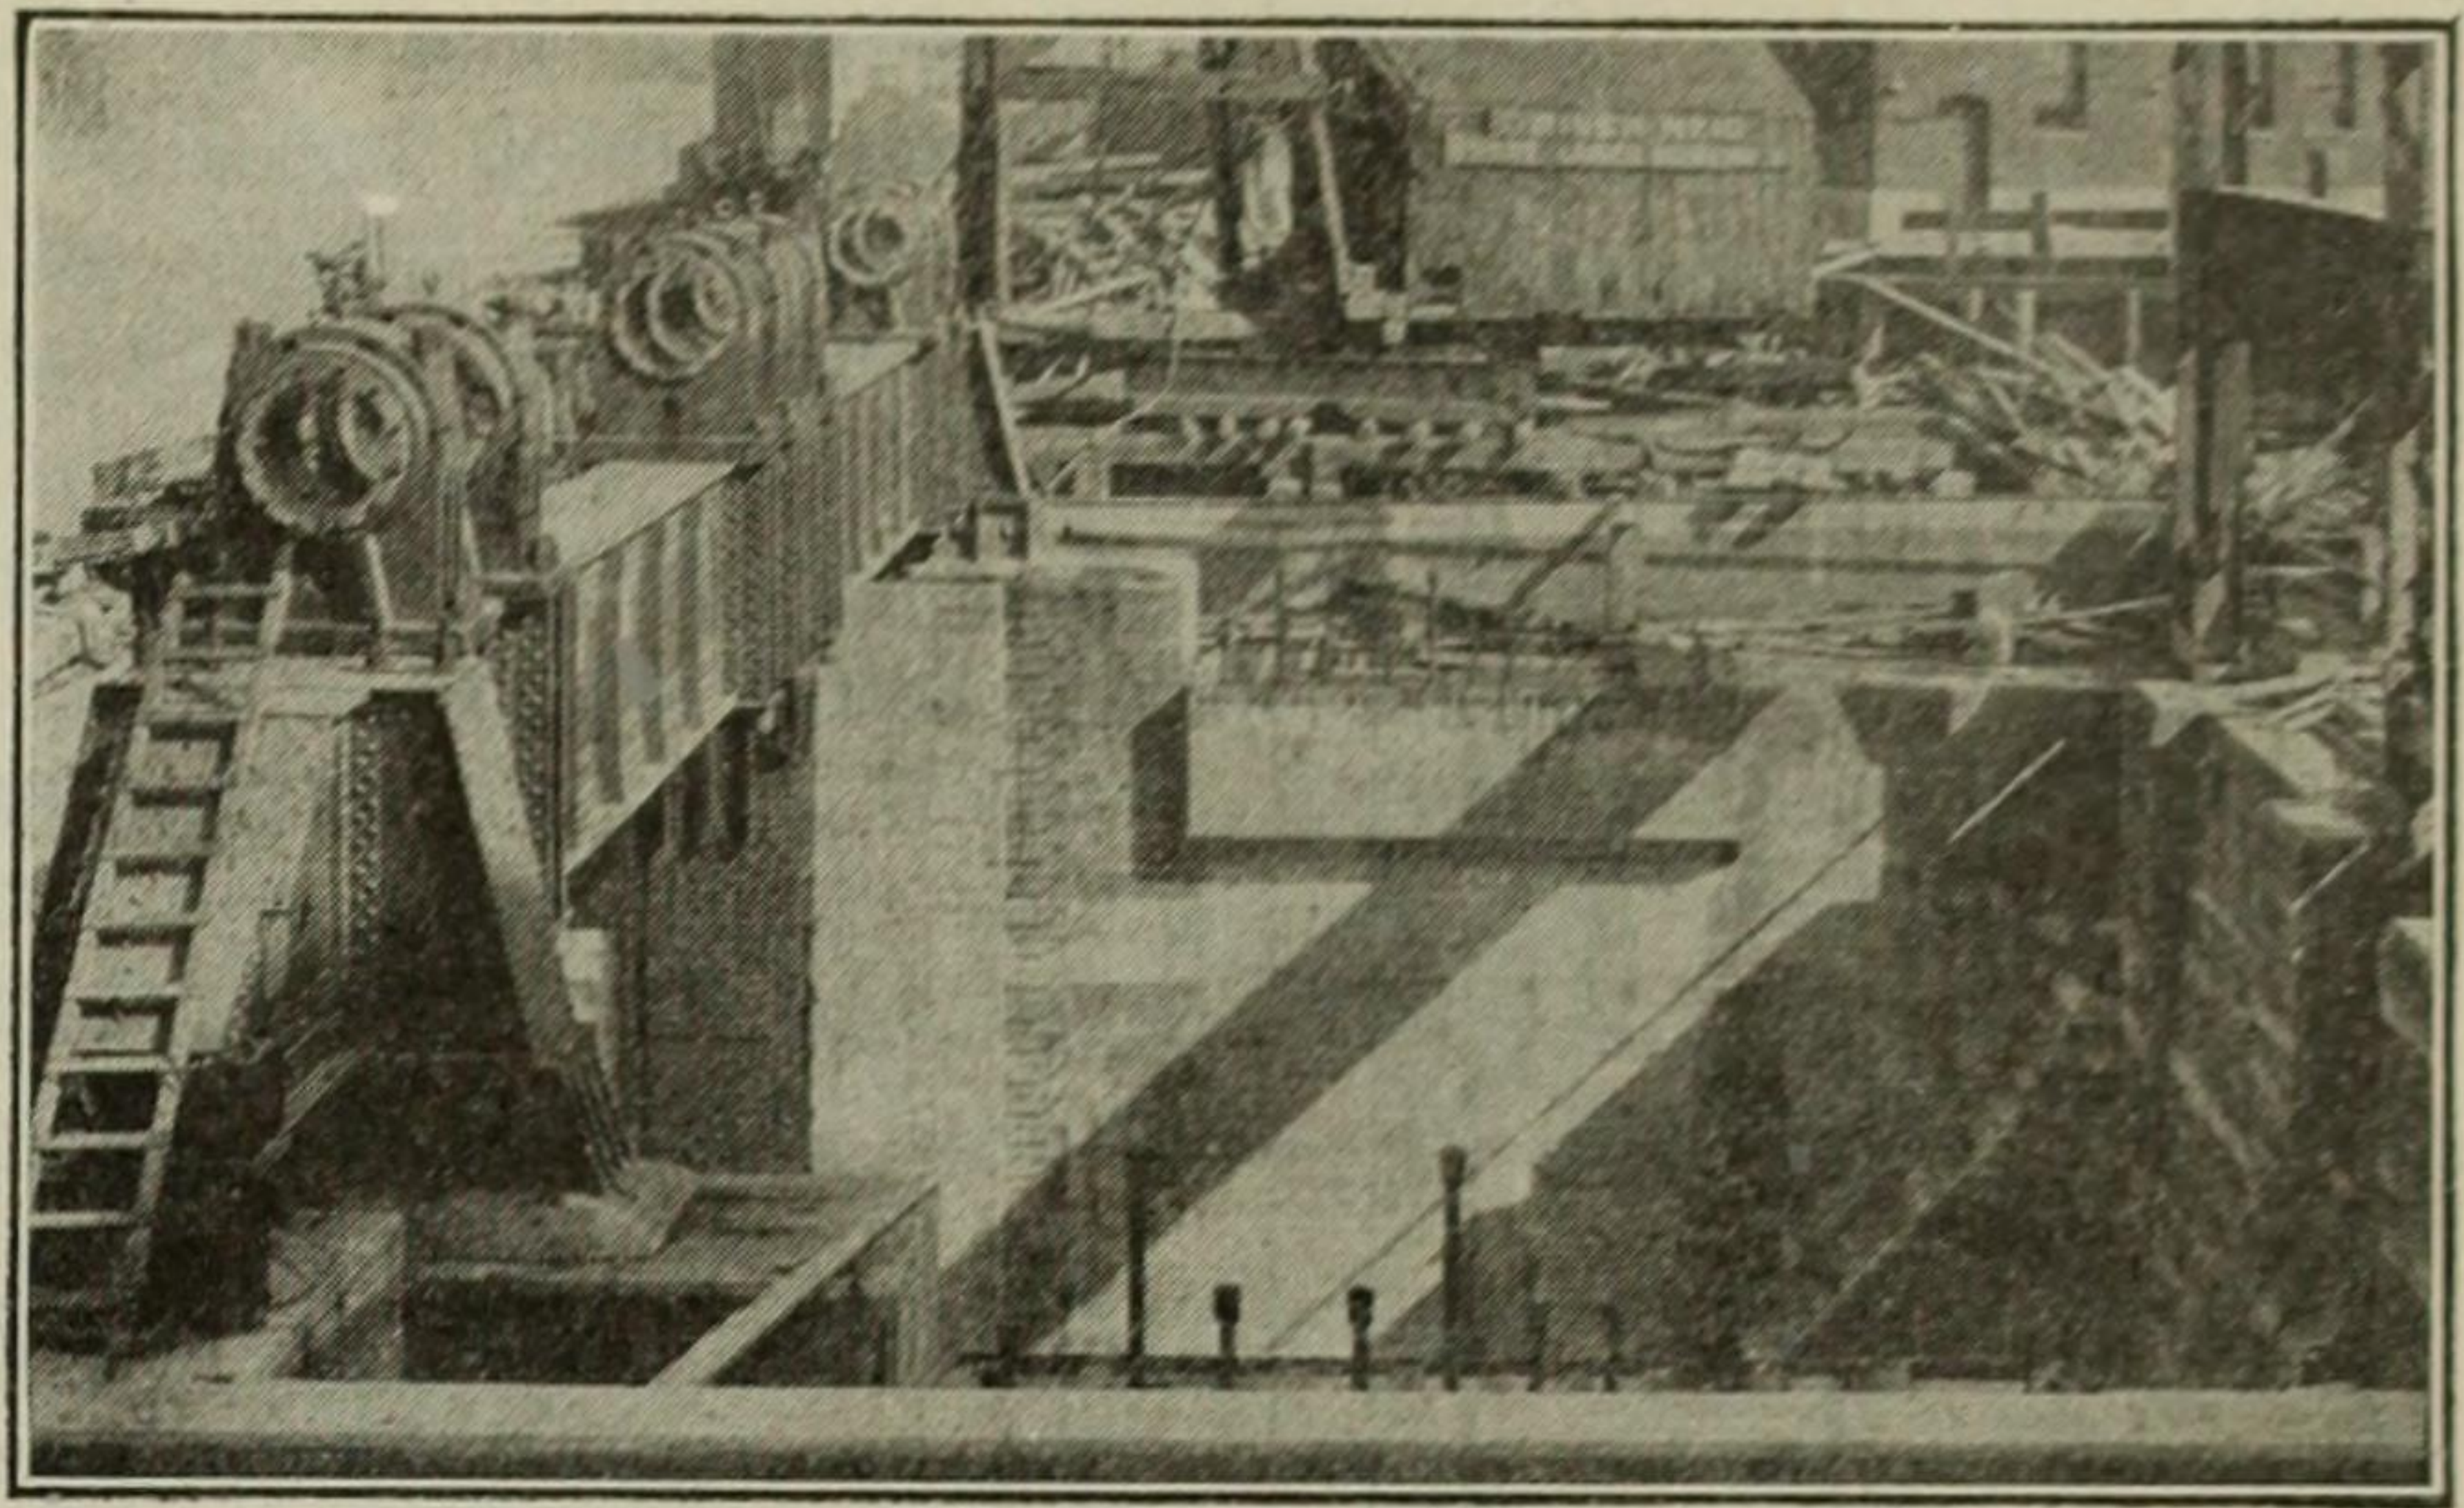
HEAVY GIRDER CARRIES TRUNNIONS
